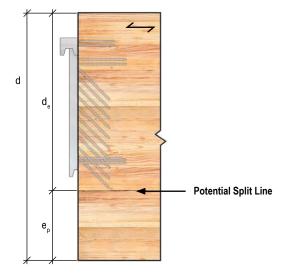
Lowest Inclined Fastener in Beam Hanger Does Not Support Bottom of Member
